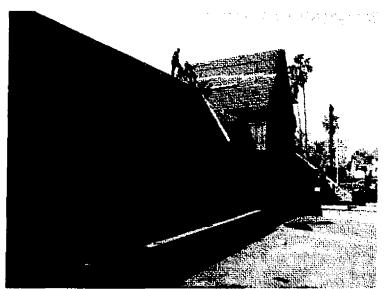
New Exterior Walls and Raised Roofline, Installed in 2011 SOURCE: Vintage Vices LLC, 2011
